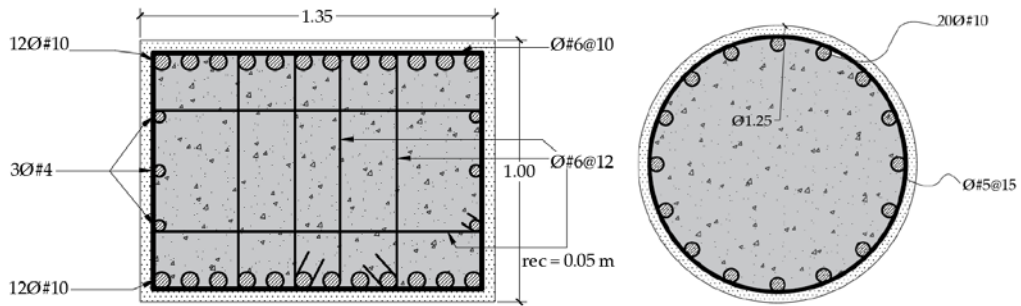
Geometry and design of: (a) cap beams; (b) columns.
